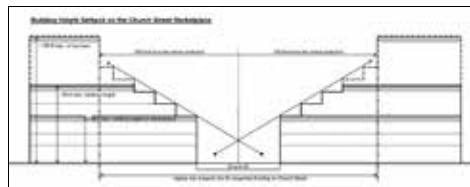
Measuring Height Limits for Church Street Buildings
